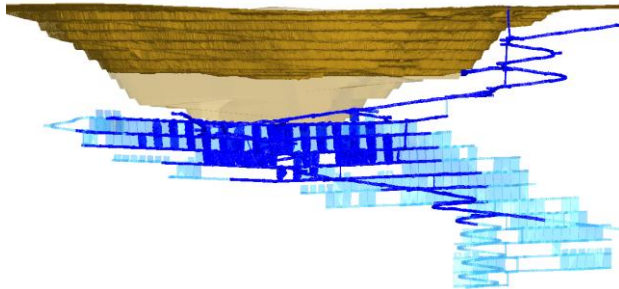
Whale Tail open pit and underground mine. Existing excavations are represented by dark colours and planned excavations by lighter colours.
